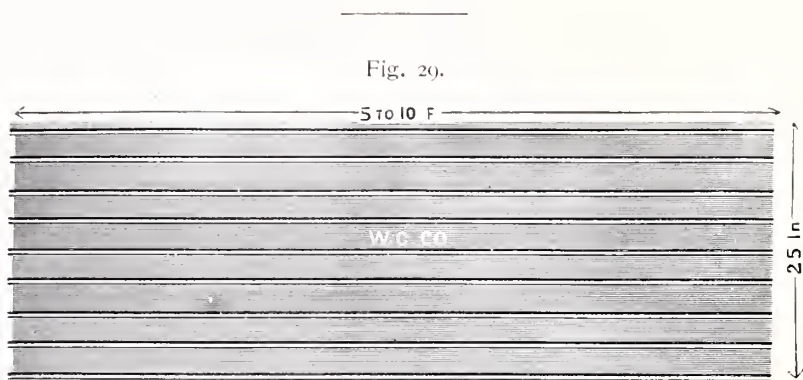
Shows sheet of Beaded Siding and Ceiling.
